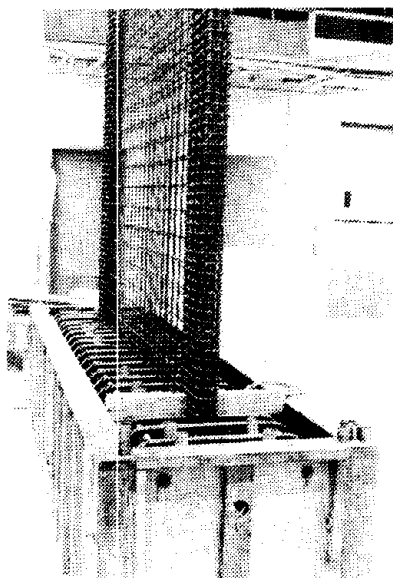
Reinforcement for Panel and Boundary Elements of Rectangular Wall
